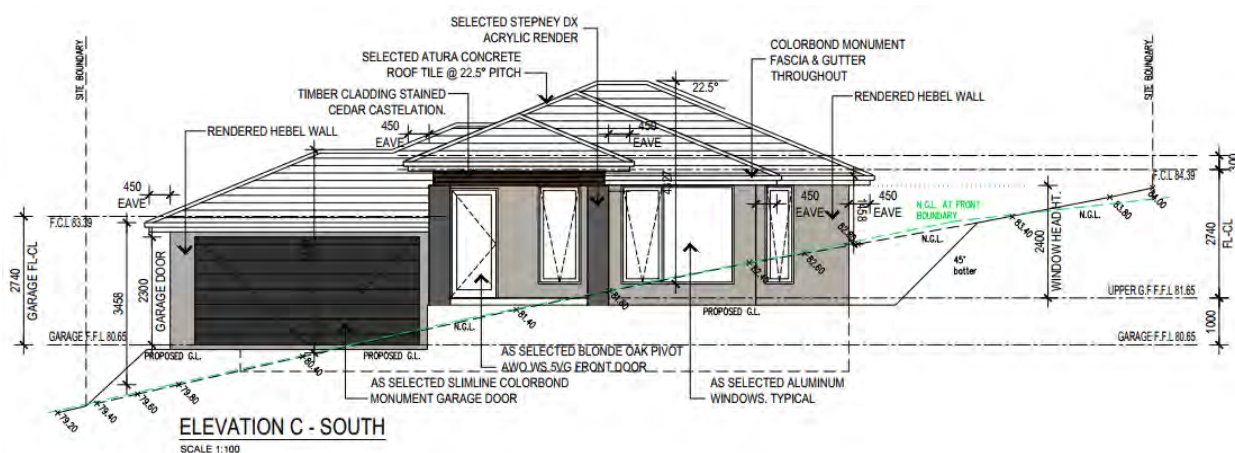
South elevation, how the dwelling will present to the street (Source: Aliya Homes TP200)
